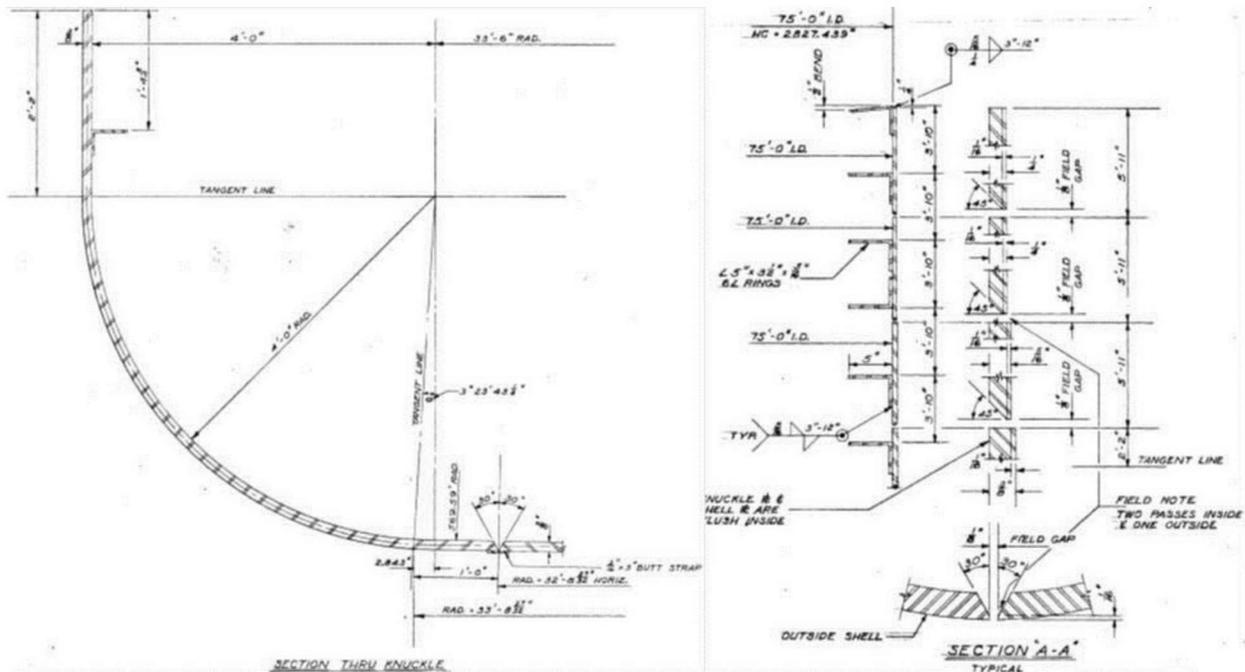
Construction Drawing for 241-TX Farm, 100-Series, Type III Tanks Bottom Knuckle Weld
